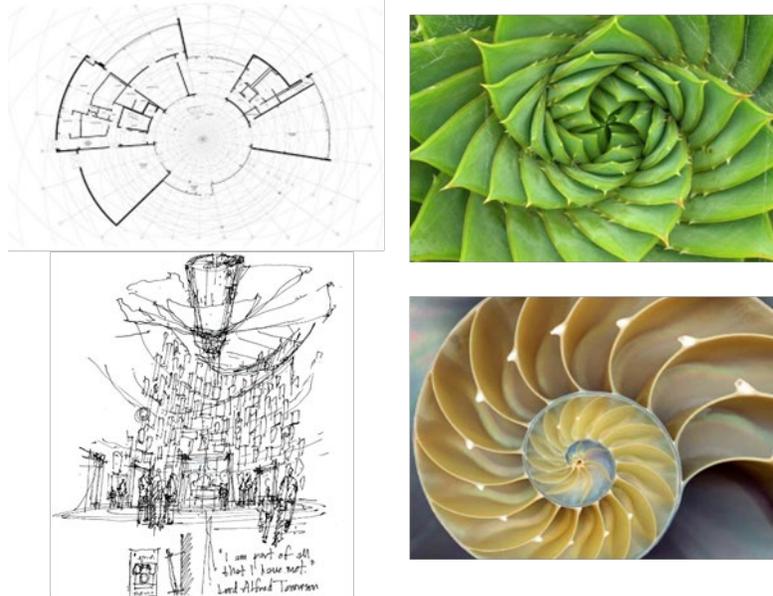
Fibonacci sequence and the floor plan (GWWO architects, n.d.)
